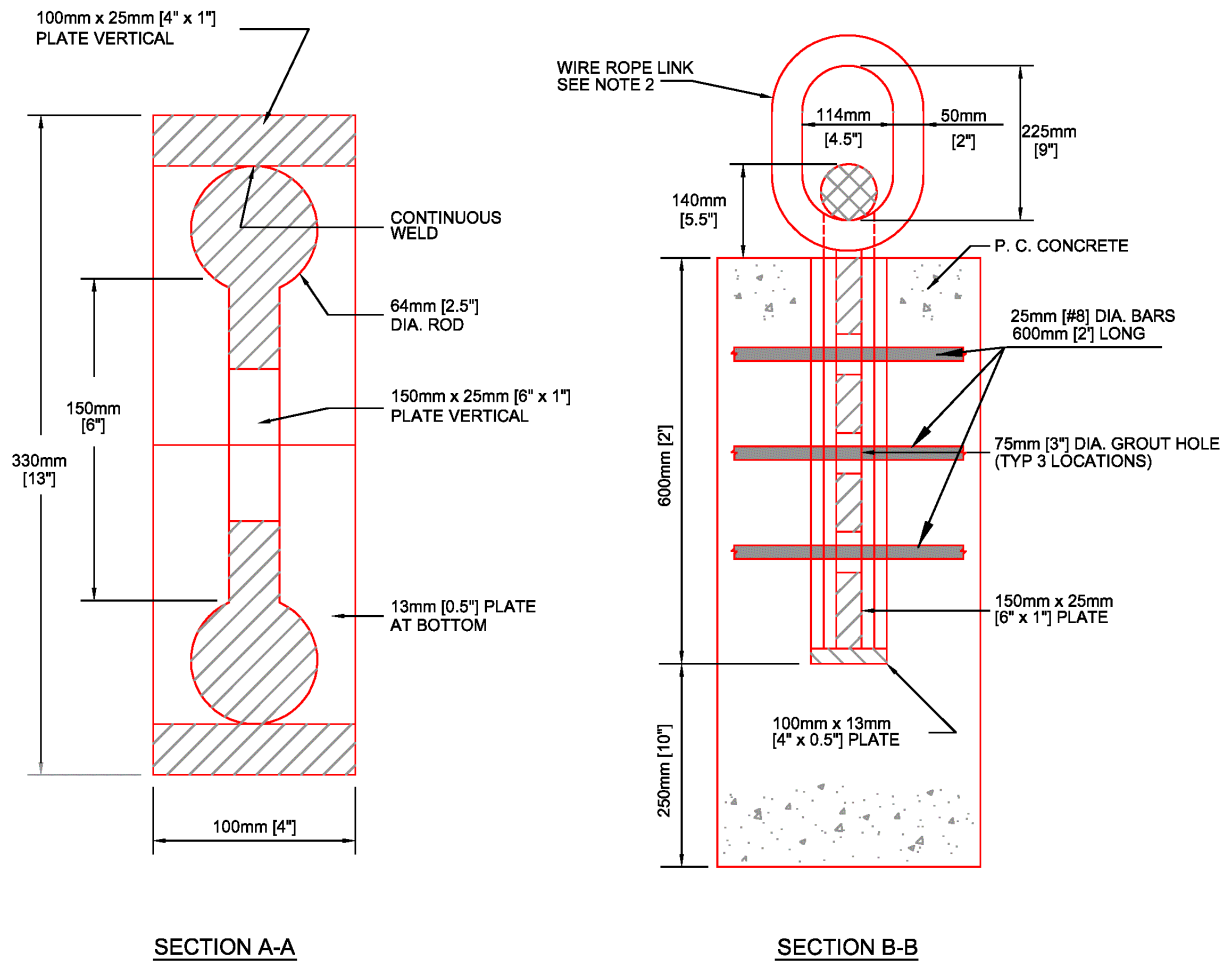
Example of 267 kN (60,000 LB) Square Aircraft Anchor Block and Cross Section
